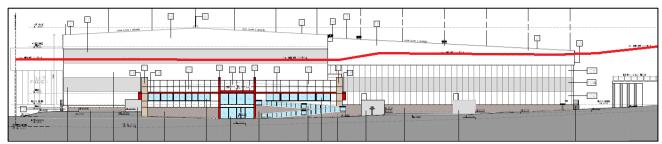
View of the eastern elevation noting the extent of the proposed building height variation.
